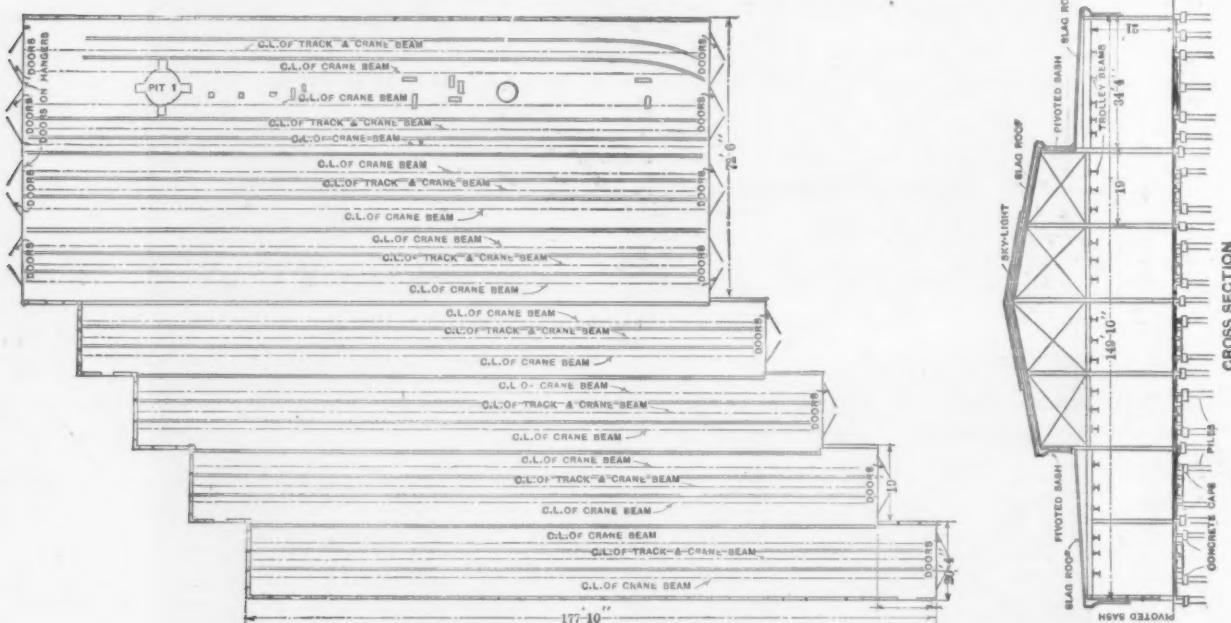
Plan and Cross Sectional Elevation of the New Harlan & Hollingsworth Underframe Shop.
